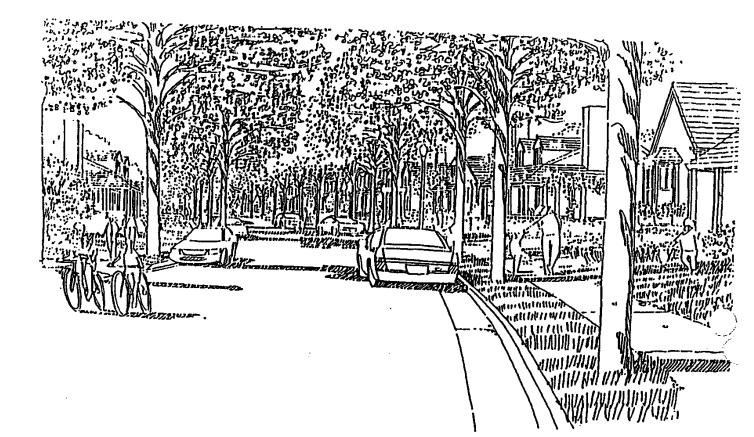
## FIGURE viii – MOUNTAIN HOUSE CREEK COMMUNITY PARK VIEW LOOKING NORTHEAST
